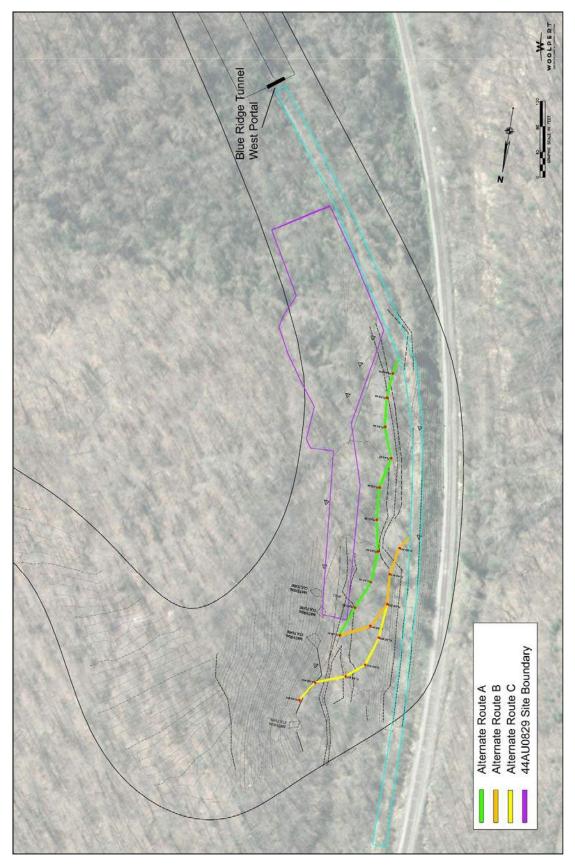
Plan showing location of alternate routes A, B, and C, shovel test pits, and site 44AU0829.
